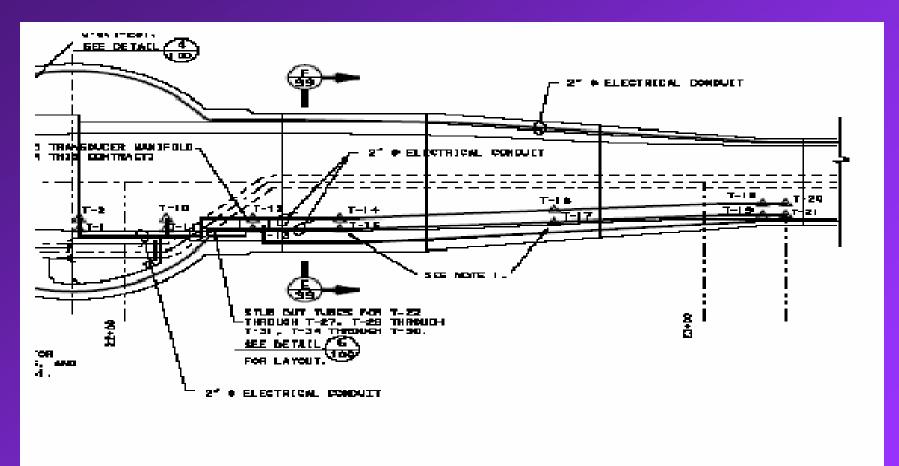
Plan View of Instrumentation (Flush Mounted Pressure Transducers)
